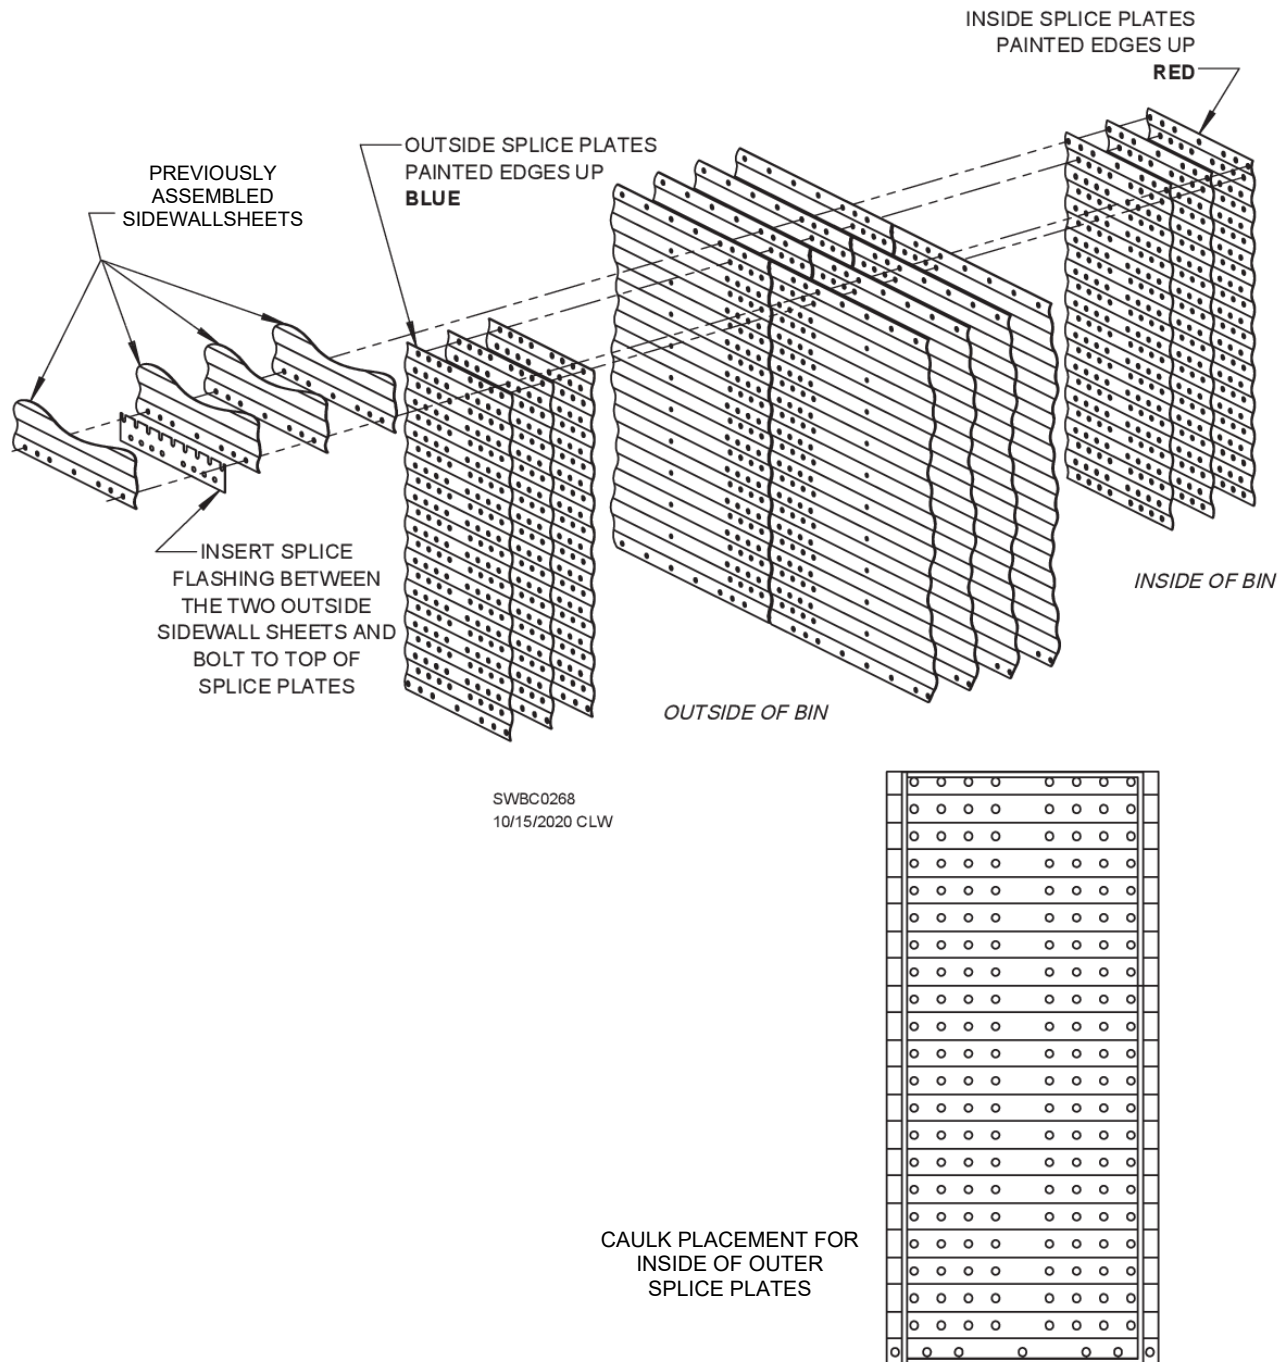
Splicing quadruple-laminated sidewall sheets
